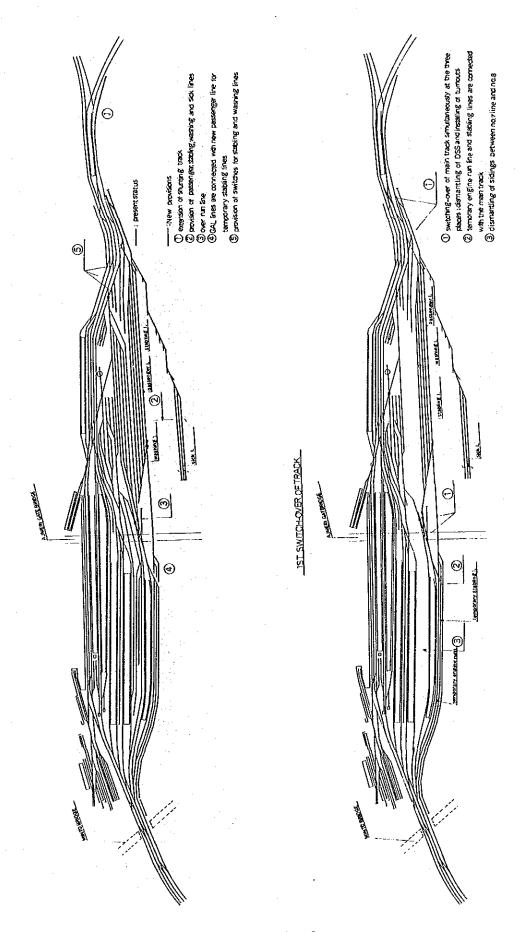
(1) Switch-over Steps in New Delhi Yard
